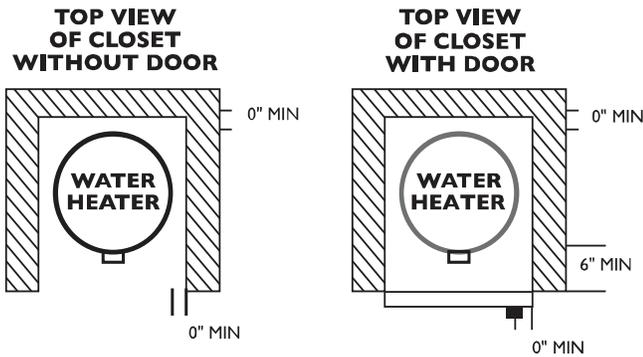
This may be used as reference guide to locate the specific clearance locations. A minimum of 24 inches front clearance should provide for inspection and servicing.
